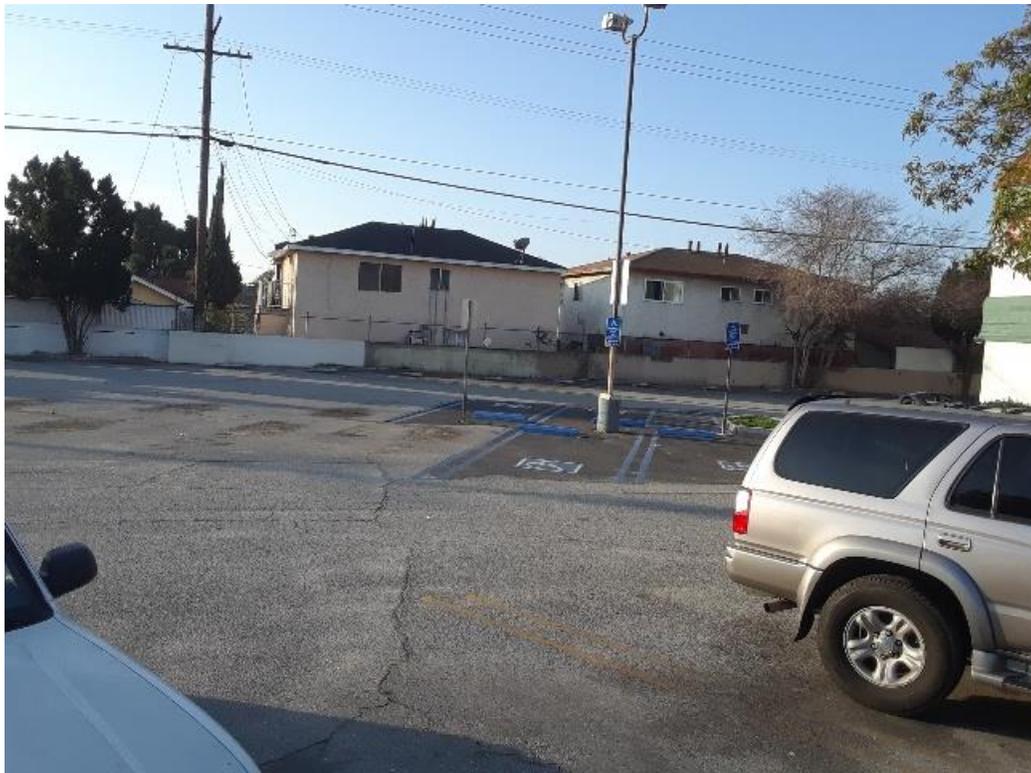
View from the project site facing south toward the adjacent residential neighborhood.
